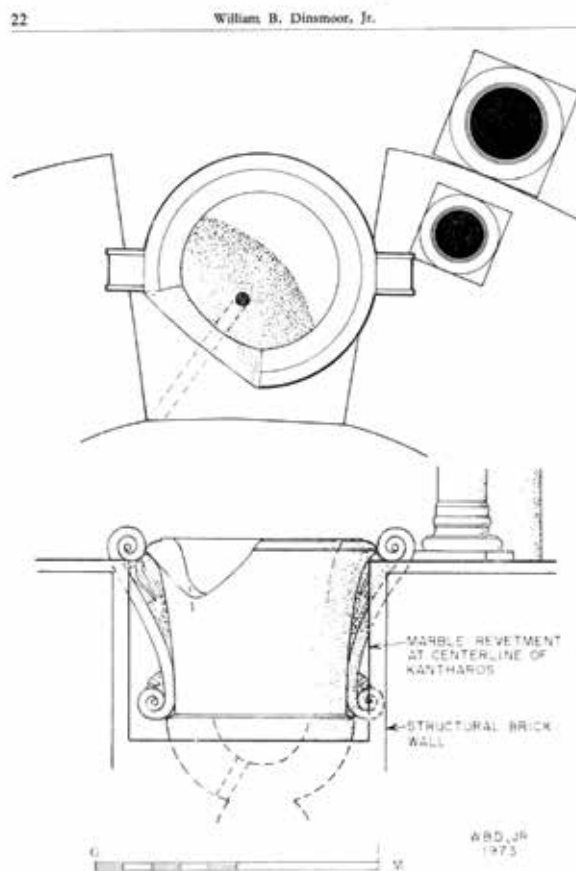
Plan and elevation of the kantharos in its final setting place (Dinsmoor 1975, 22).
